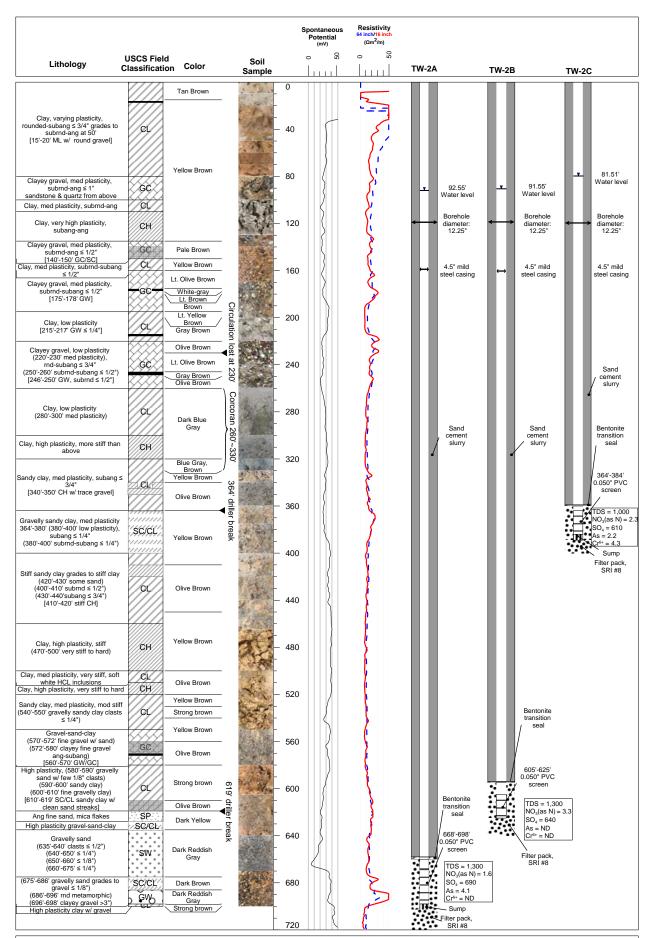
Well Construction, Geologic Information, and Water Quality Notes at TW-2 Location Project No. 0624-001-01 3/17/2017
